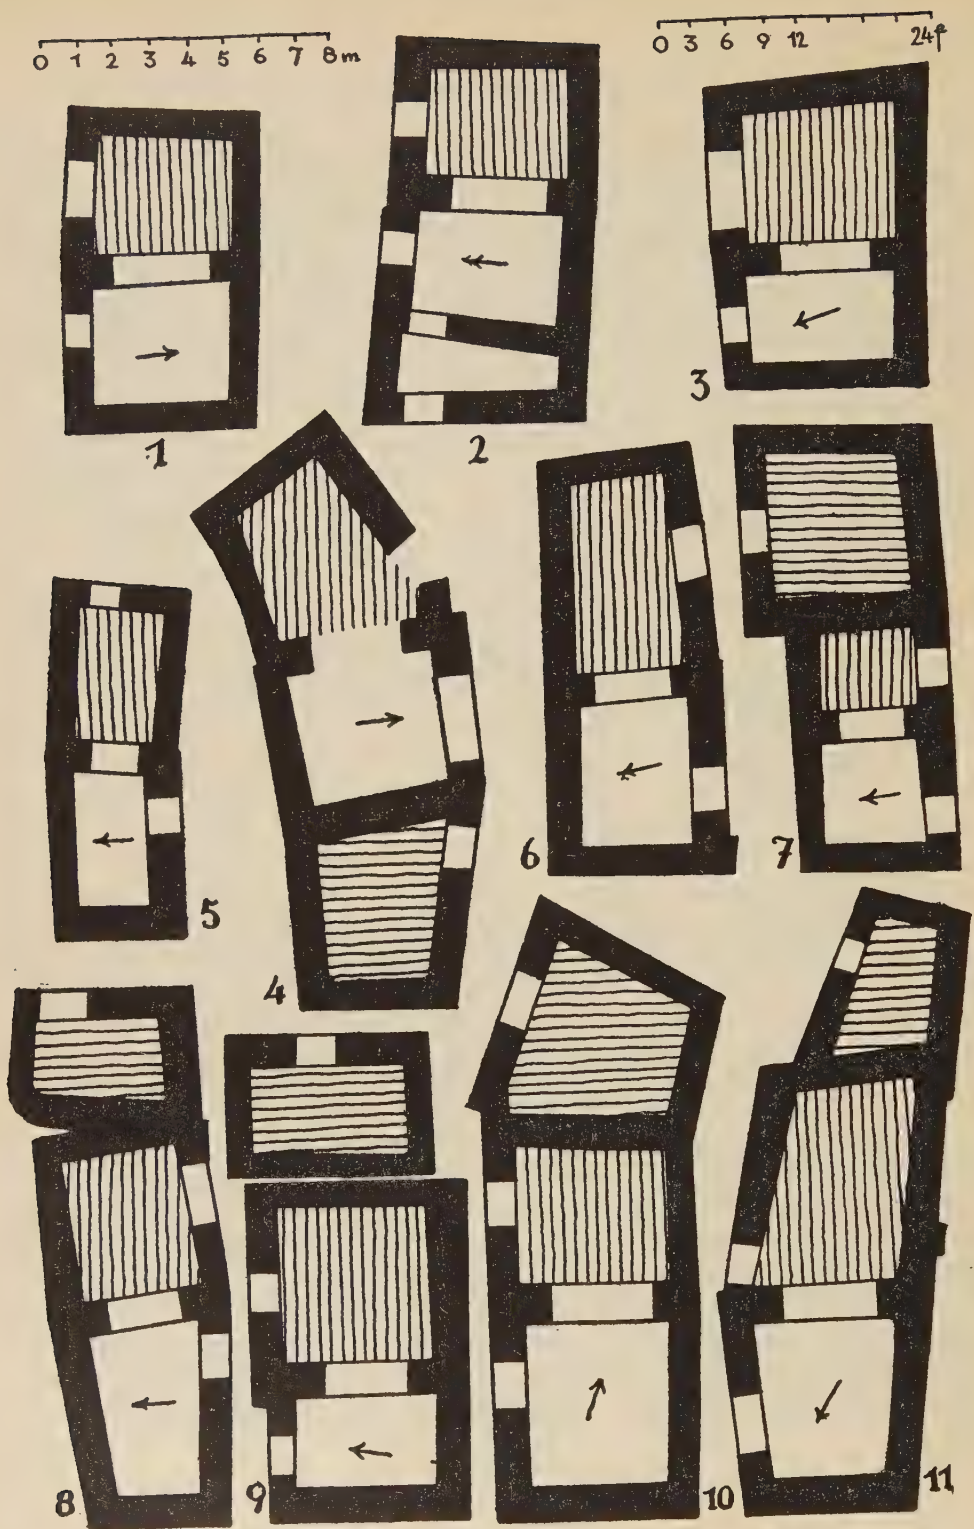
GROUND-PLAN OF STONE SOCLE OF DWELLING-HOUSES, 1:200
